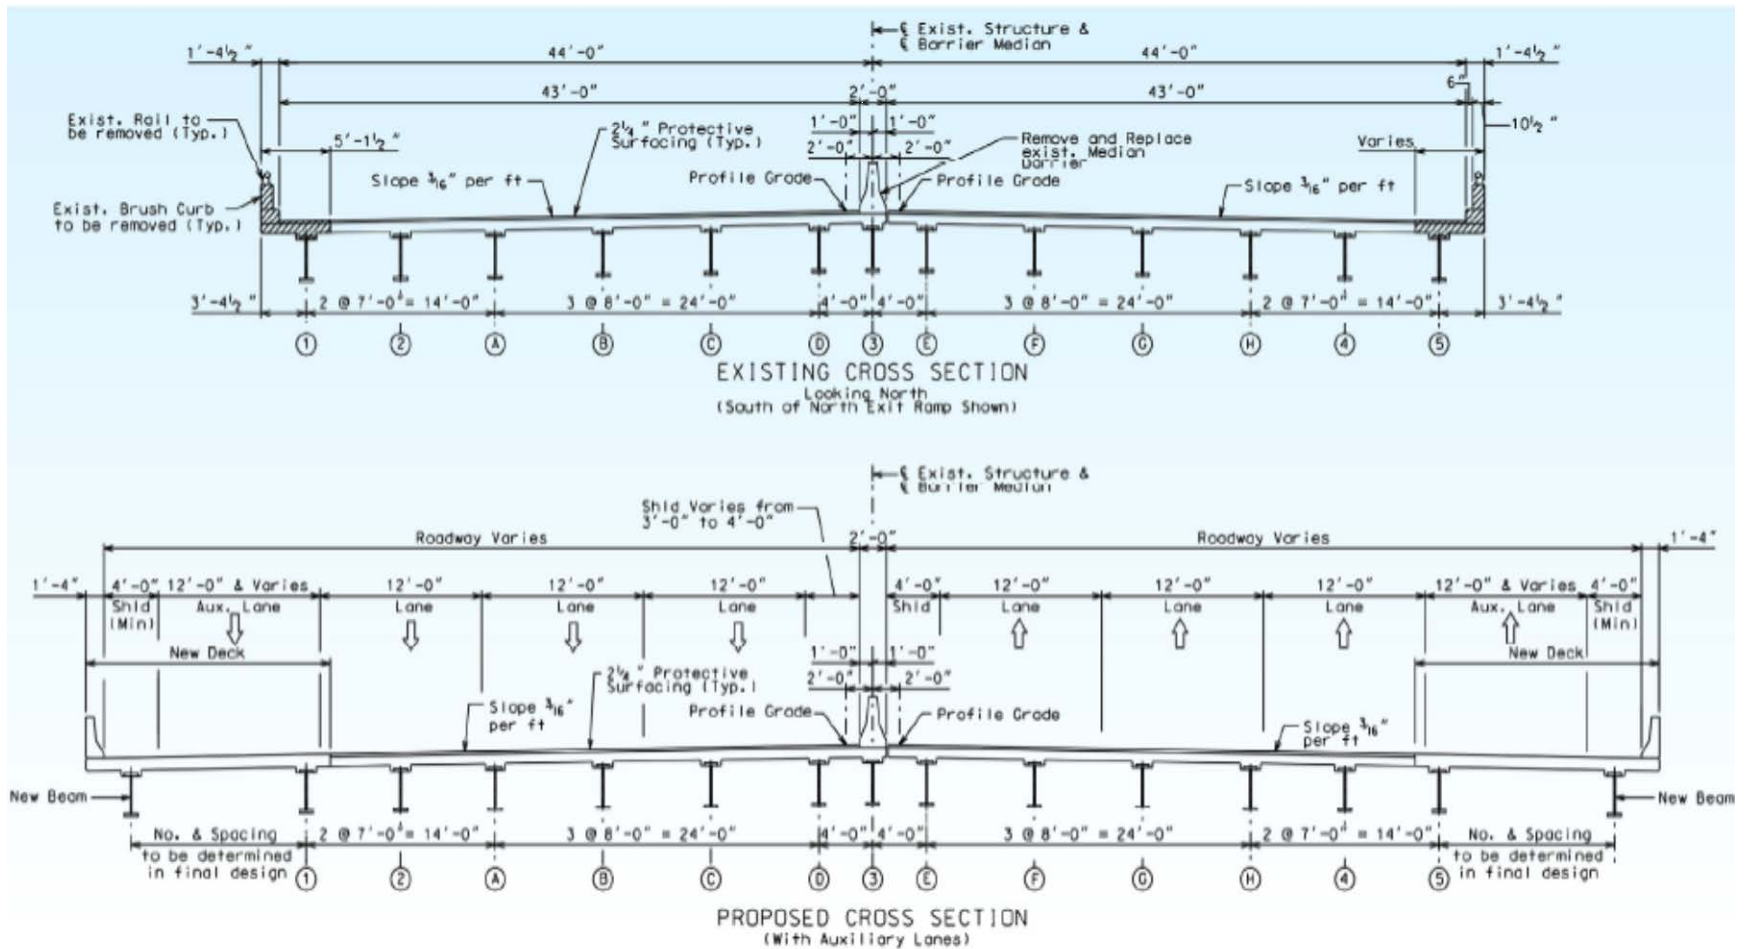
Existing and proposed typical cross section of I-29/35 south railroad viaduct.
